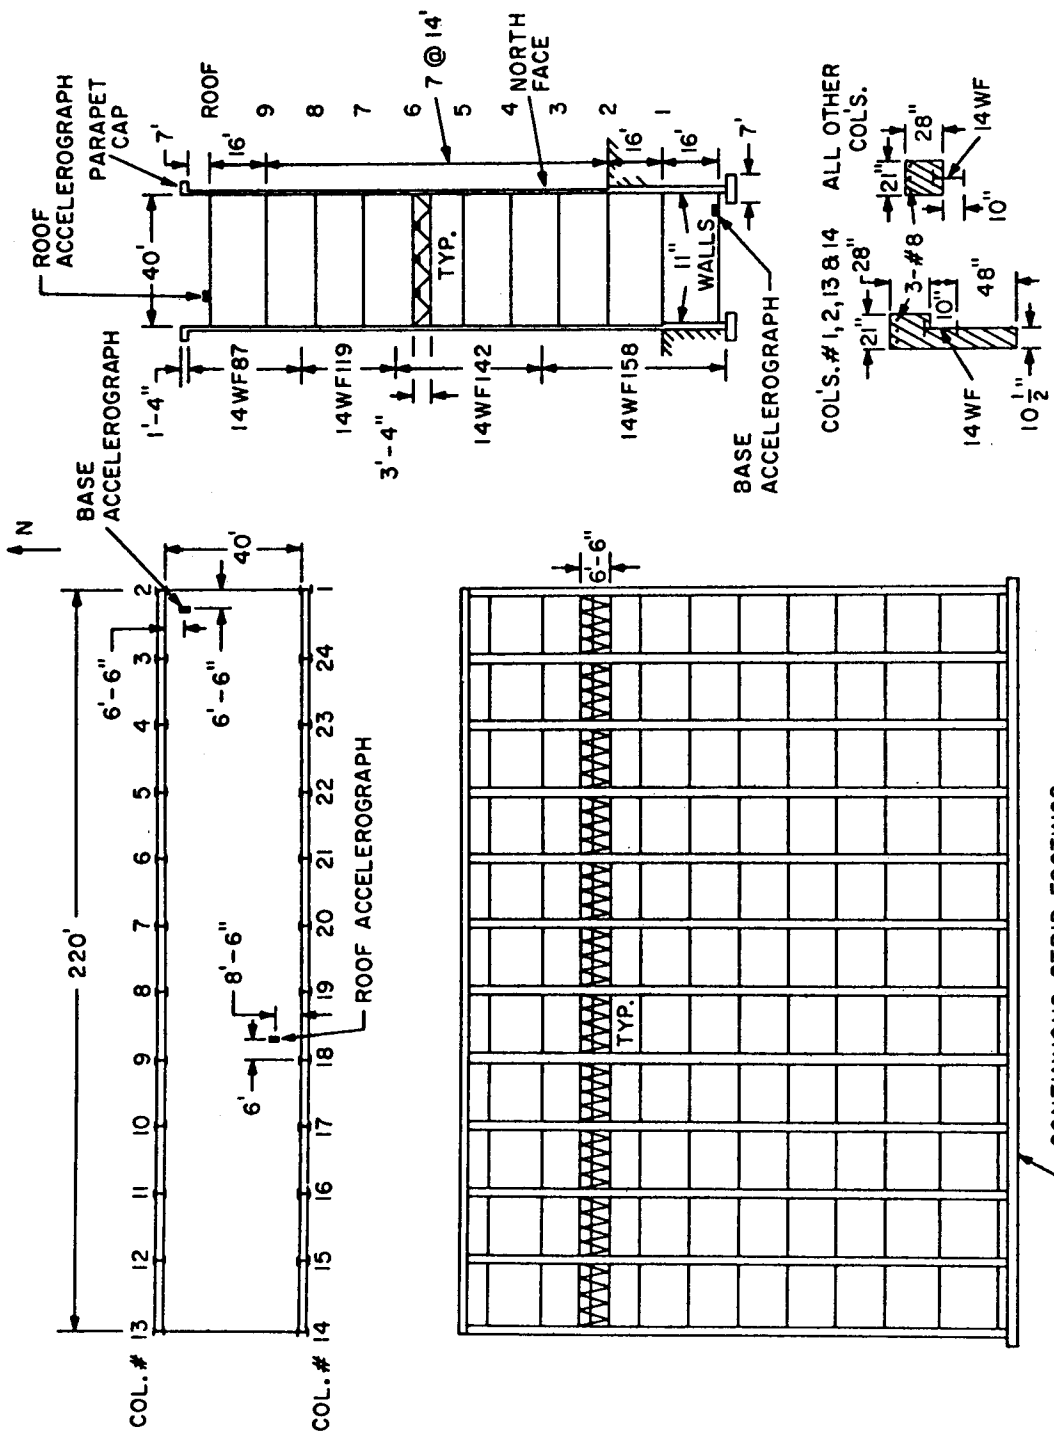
13. Typical floor plan and longitudinal and transverse sections of JPL Building 180 (from Wood, 1972).
